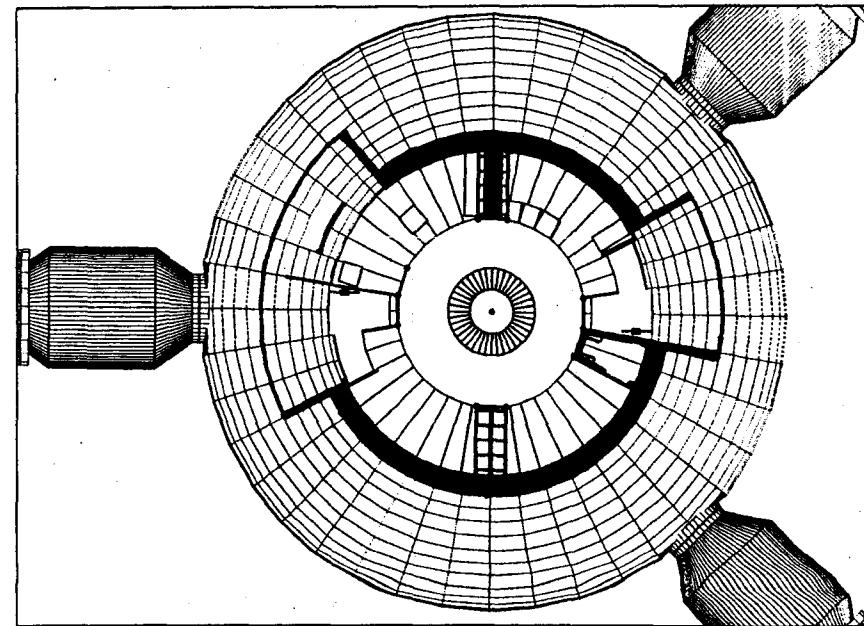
Floorplan of Domus I with upper level of dome illustrating the crew support facility.
